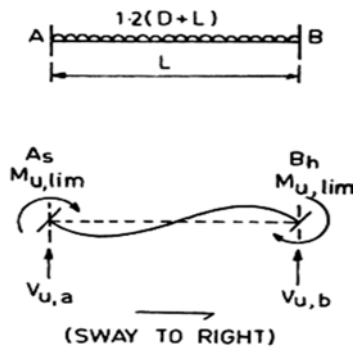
CALCULATION OF DESIGN SHEAR FORCE FOR BEAM
